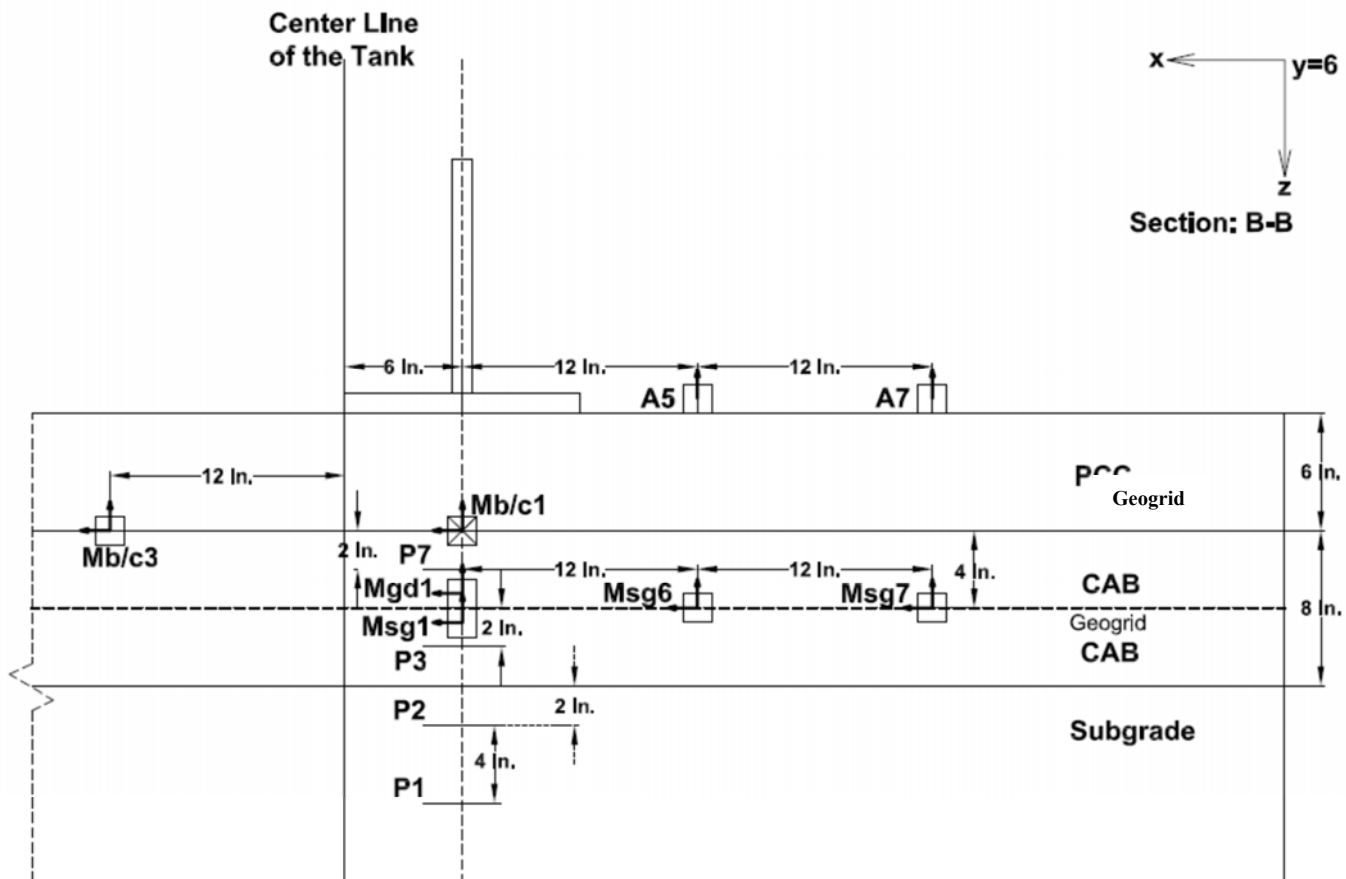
Instrumentation plan for experiment No. 9—Profile view, Y=6 inches
